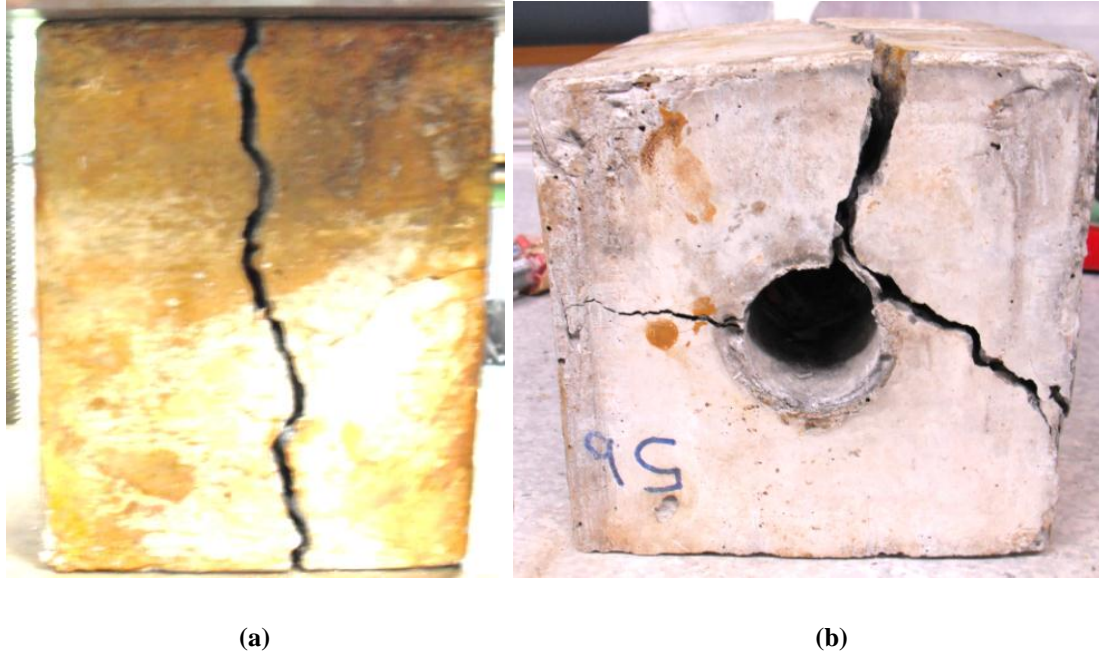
(a) 5mm crack in Specimen 3b after splitting failure occurred; (b) Splitting damage in Specimen 5b after testing.
